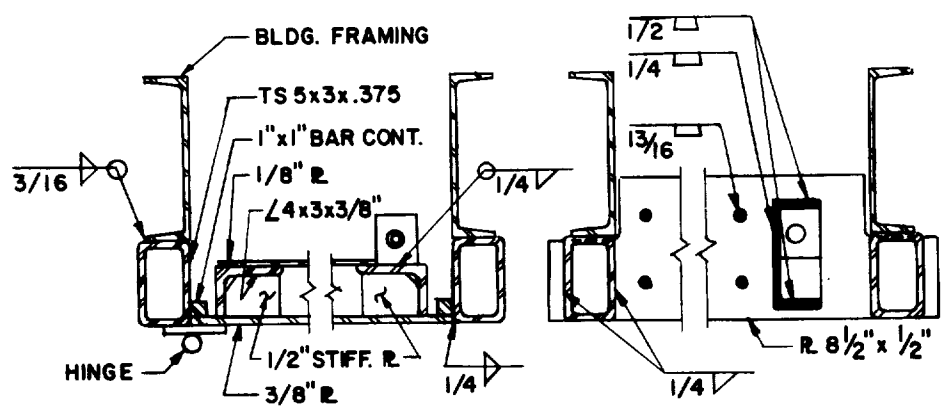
Details of typical fasteners for cold-formed steel panels
